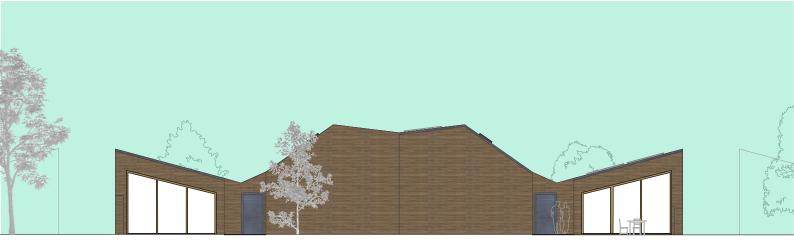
Garden-side facade, View S-E, 1:200
